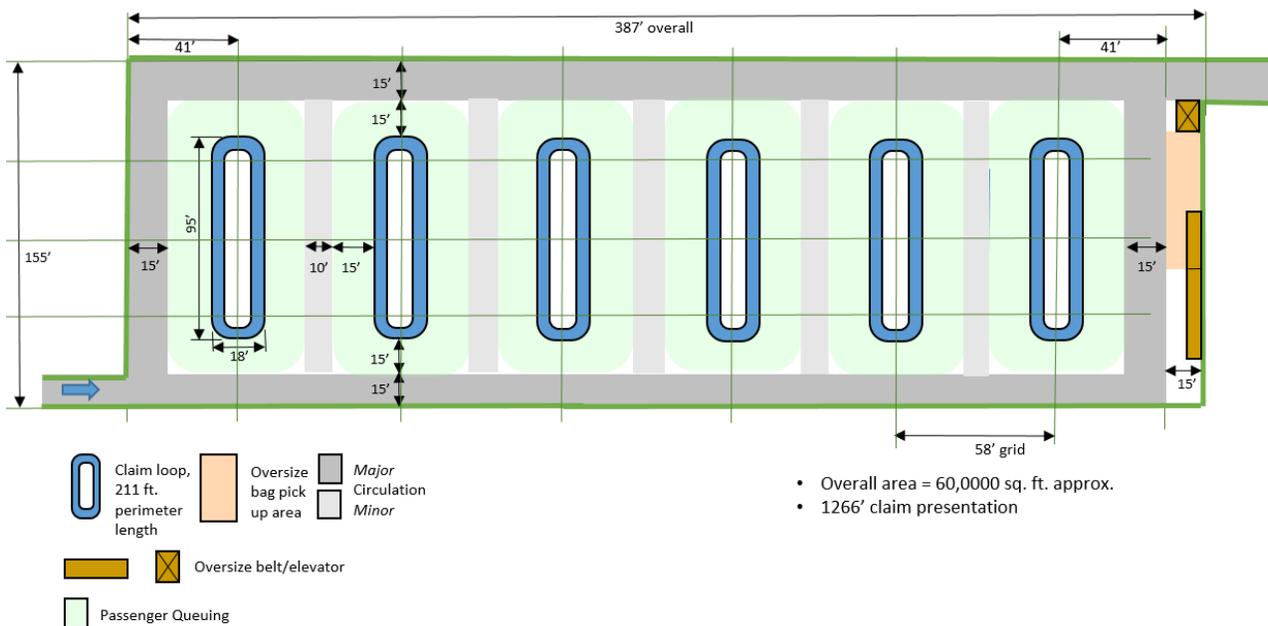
BHS Facility Space Requirements – Possible layout approach for claim hall
